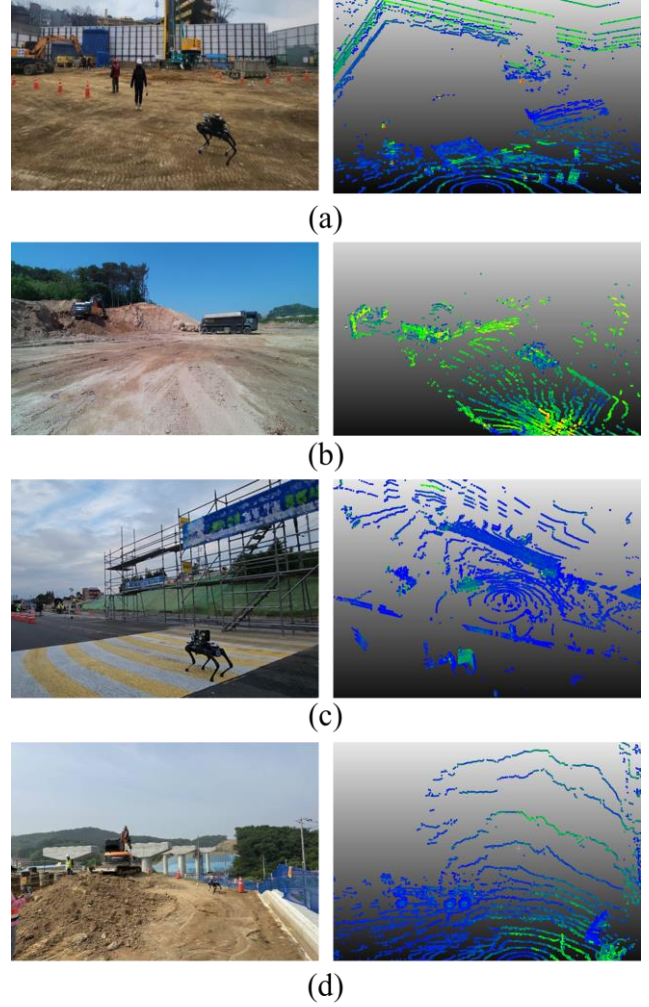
Picture of the site (left) and examples of point cloud data collected at each site(right); Site 1, 2 and 3 were used for training and validation, and Site 4 was used for testing; (a) Site 1, (b) Site 2, (c) Site 3, (d) Site 4.
